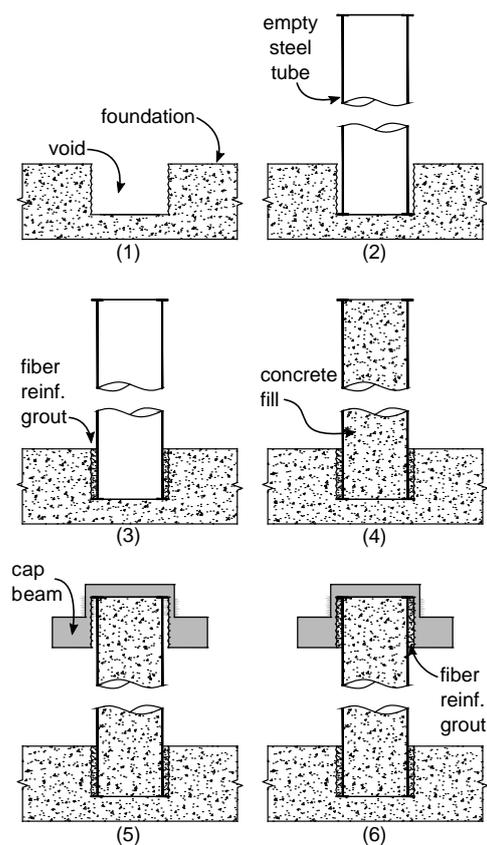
C Construction Sequence for Embedded Ring Connection
